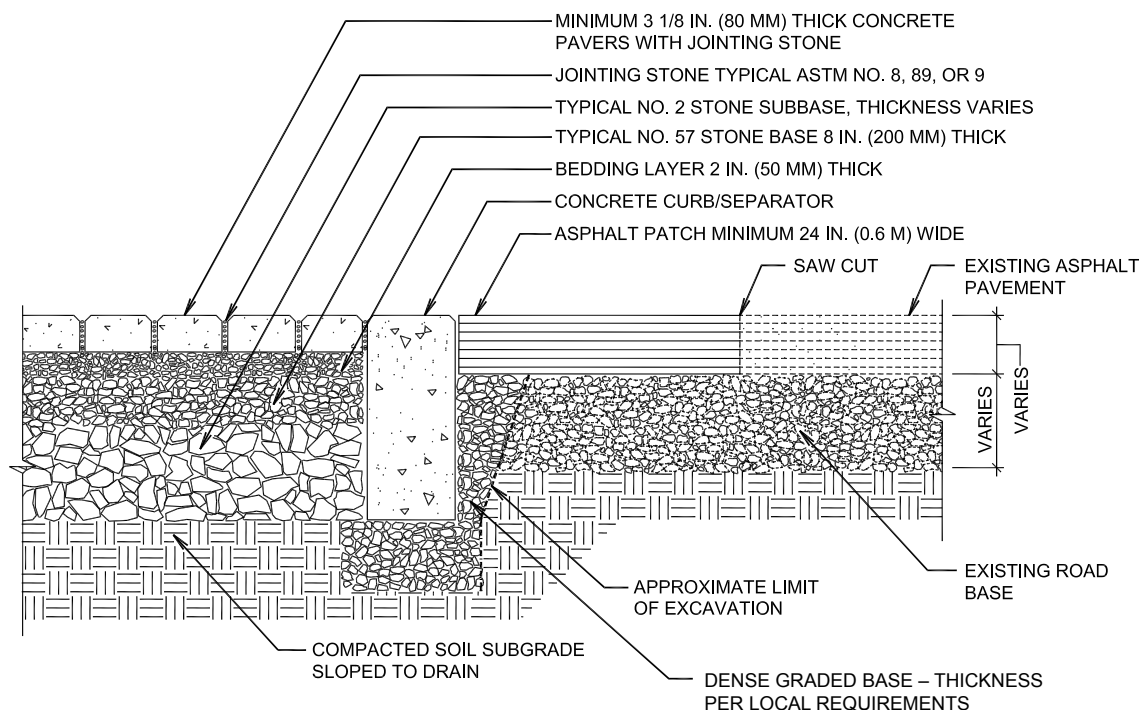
Typical cast-in-place concrete curb separates PICP from an adjacent asphalt pavement.
